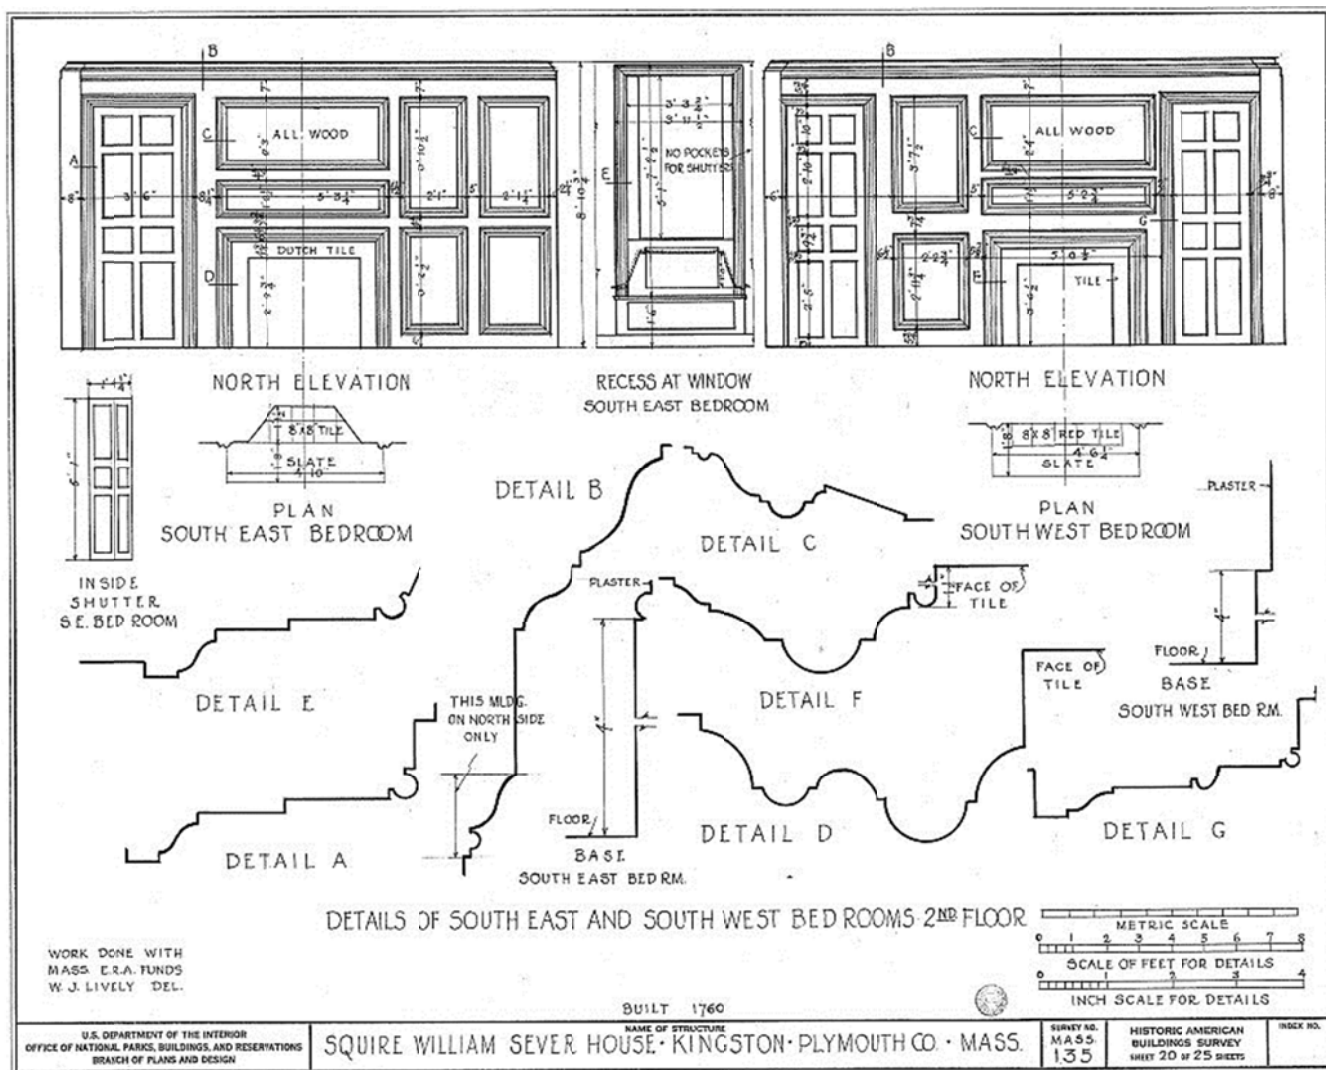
Second-floor front chambers, elevations, HABS, 1935.
